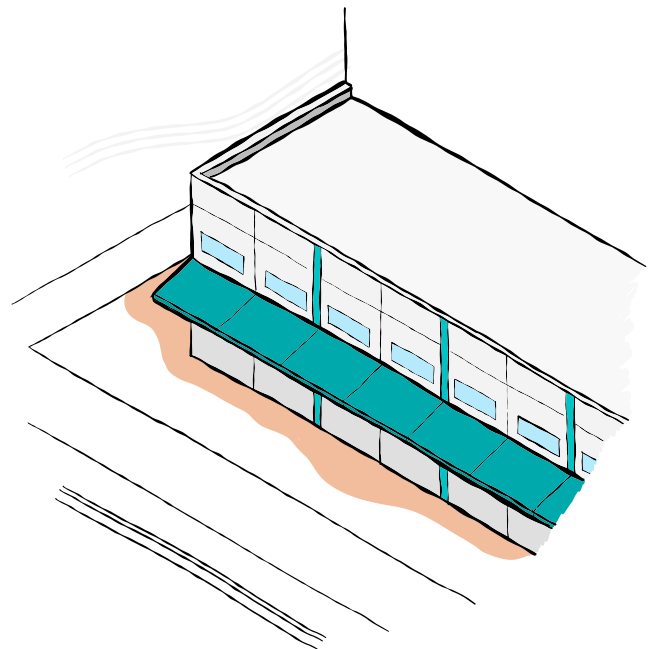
Provide continuous weather protection along building frontages wherever possible.
